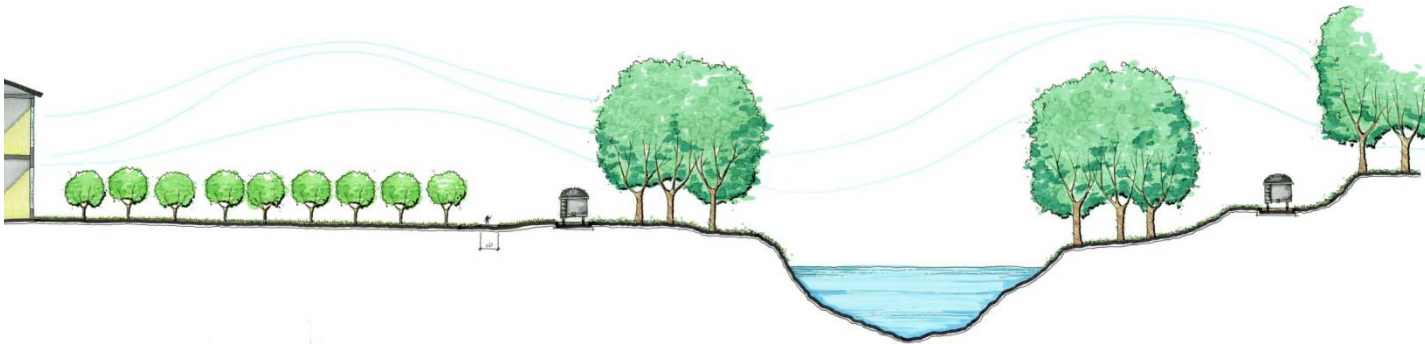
Open Space Section A-A Enlargement depicting Tree Plantation and Warehouse in relationship to the Mahoning River (N.T.S)
